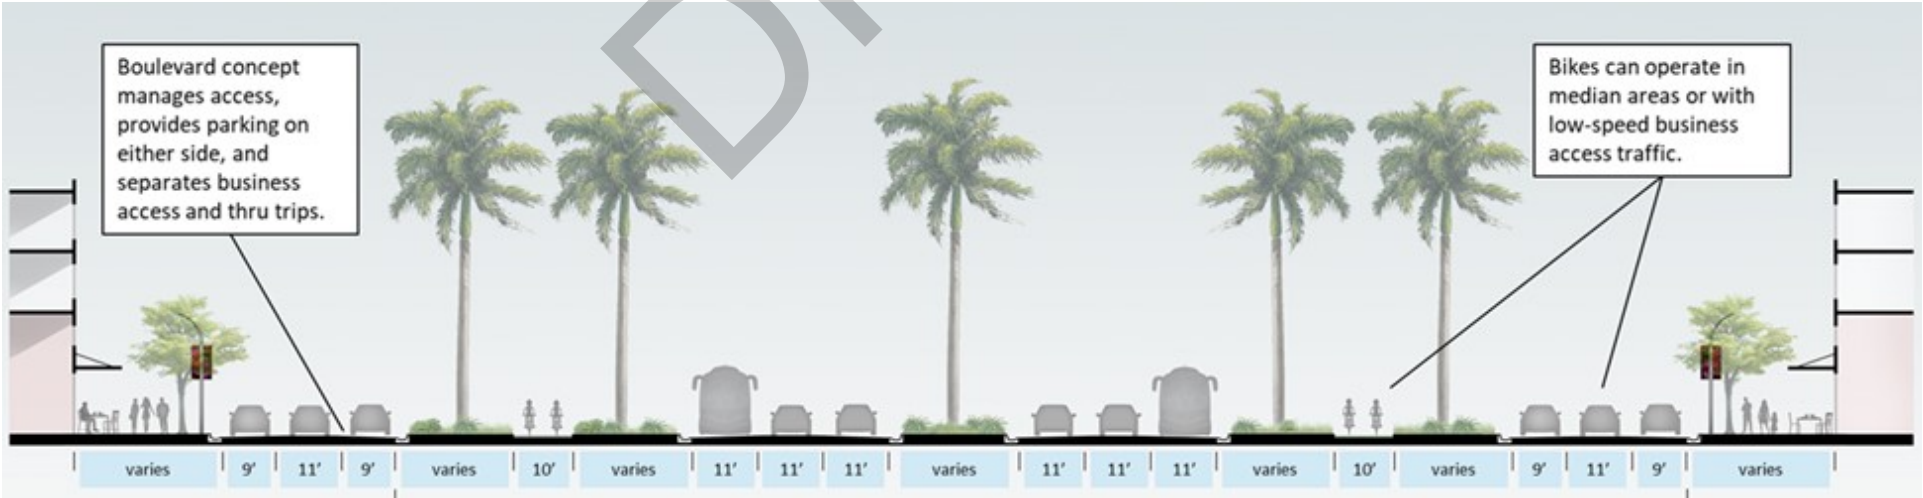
Proposed US 41 Cross Section – Naples Manor Area
